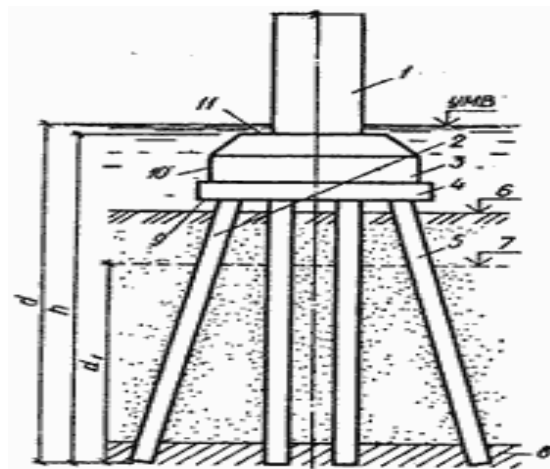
Foundation made of load-bearing element cluster 1 - above-foundation part of support; 2 - foundation; 3 - pile cap; 4 - cement layer of concrete; 5 - bearing elements; 6 - soil surface (bottom of watercourse); 7 - level of erosion; 8 - bearing layer of soil; 9 - base of plugging layer; 10 - side surface of pile cap; 11 - foundation cut.
